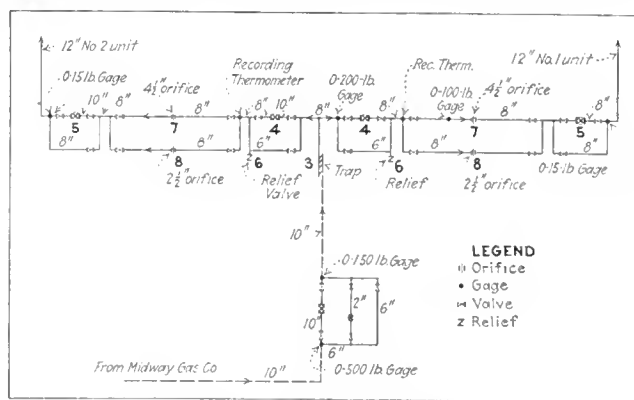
ARRANGEMENT OF METERING EQUIPMENT AT THE MIDWAY STEAM PLANT
